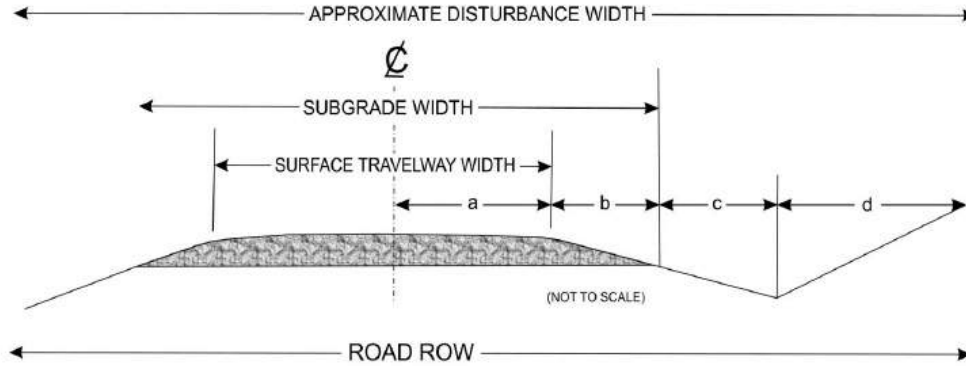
Typical Roadway Cross Section with Width Specifications
